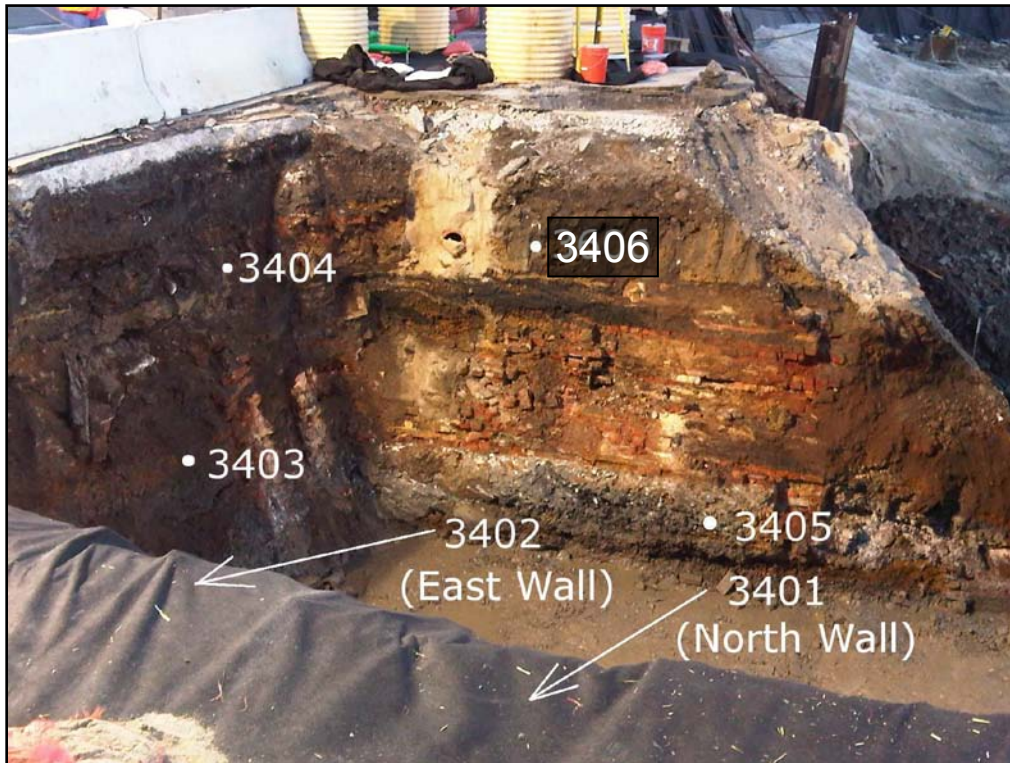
Photograph (2) of SU20 North of Pile Cap (Southeast View)
